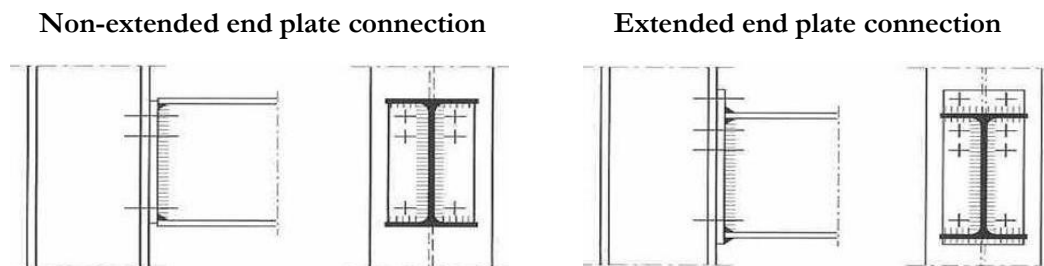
Left: non-extended end plate on a steel beam. Right: extended end plate on a steel beam (“Flexibele Momentverbindingen Tussen Liggers En Kolommen,” n.d.)
